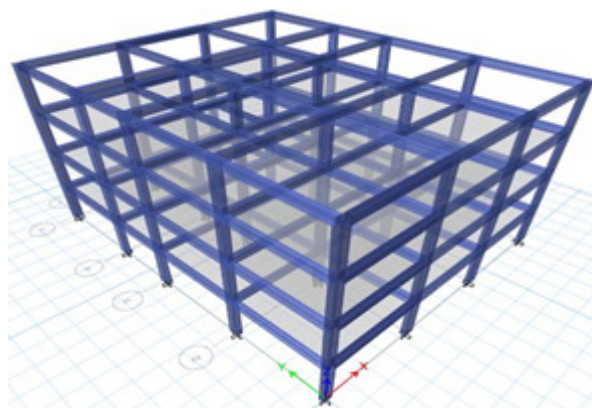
Modeled 3-Storey Reinforced Concrete Building
